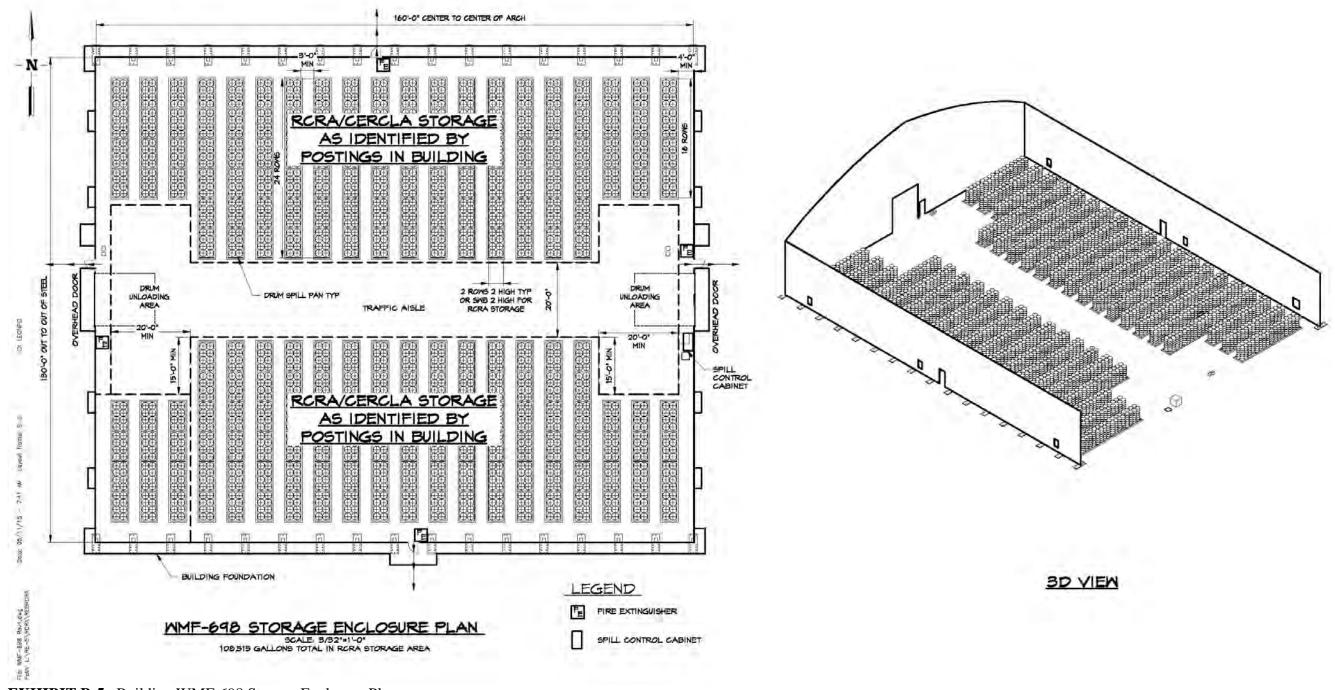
Building WMF-698 Storage Enclosure Plan
